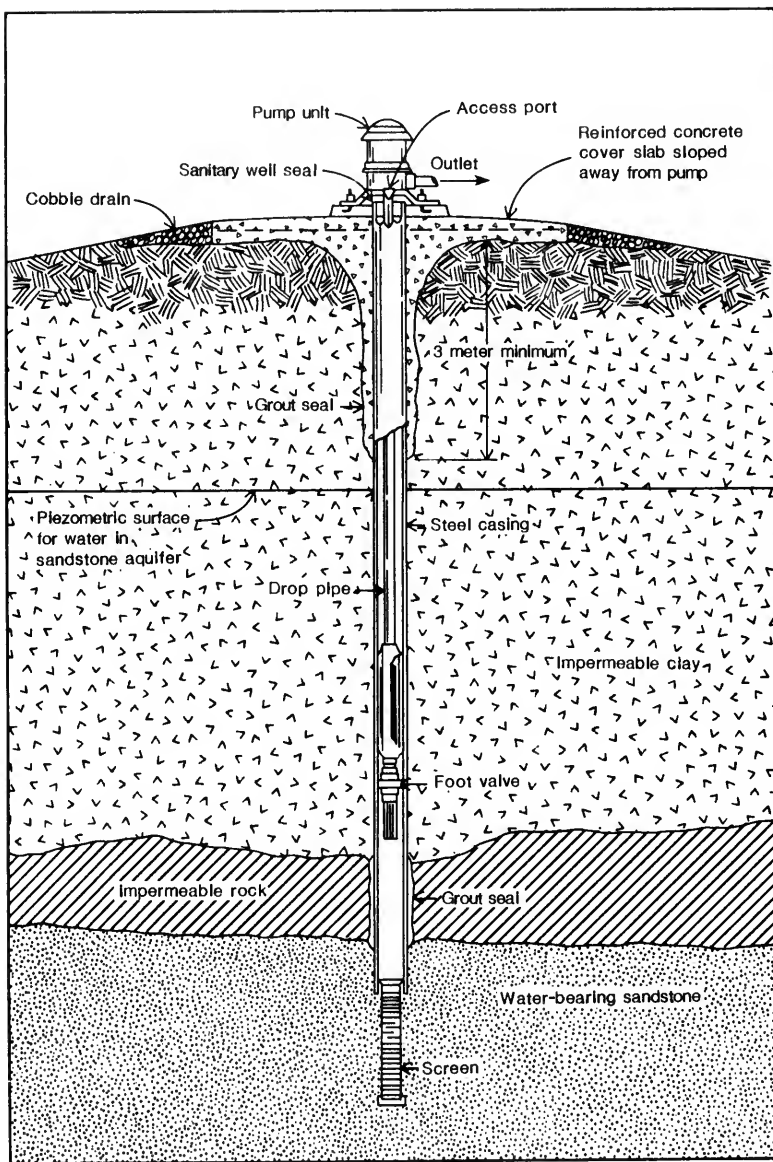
A drilled well showing grout seal, concrete slab, and well seal for sanitary purposes and port for access
